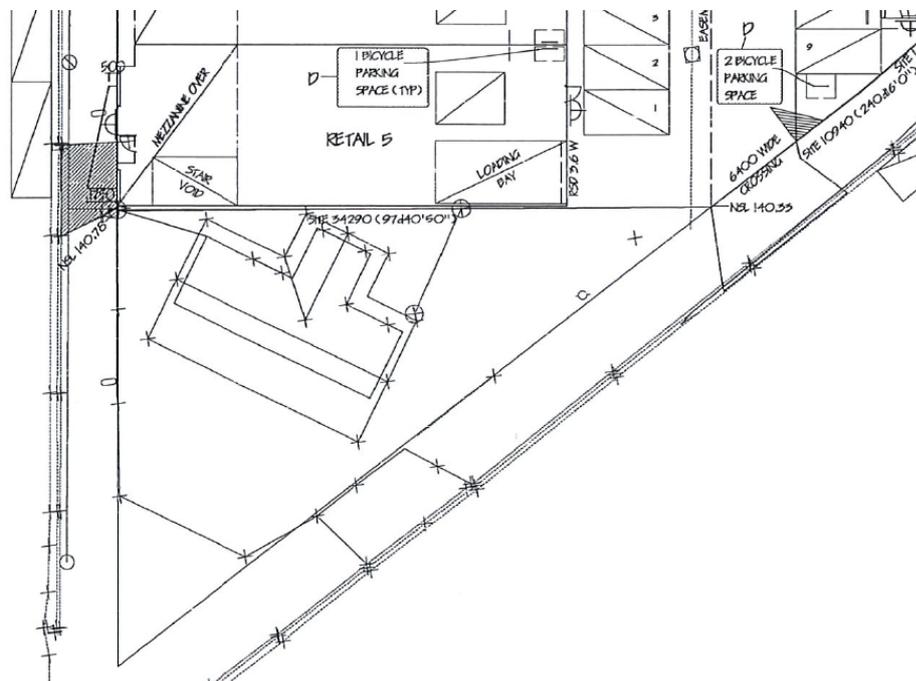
Excerpt from the plan showing the interface with the property directly south of the subject site
